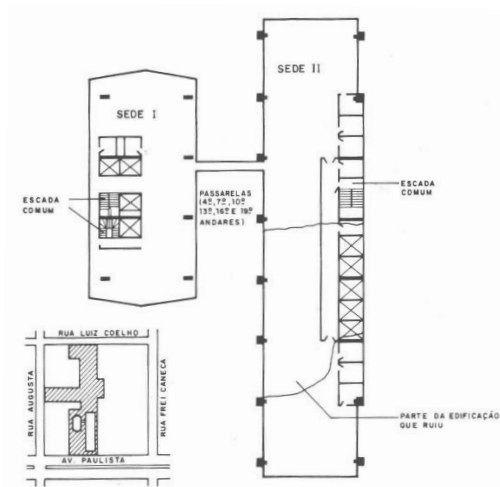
Schematic plan of the type pavement of CESP Sede I and Sede II buildings showing the sector that collapsed
